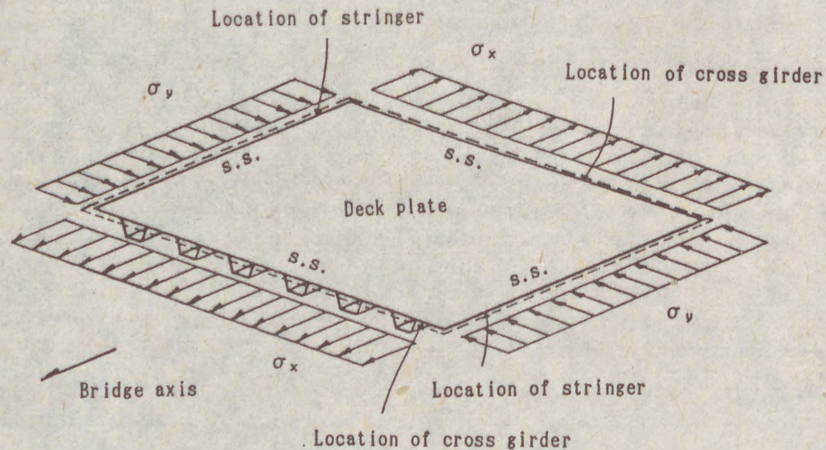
Stiffened Plate Subjected to Longitudinal Tension and Transverse Compression
